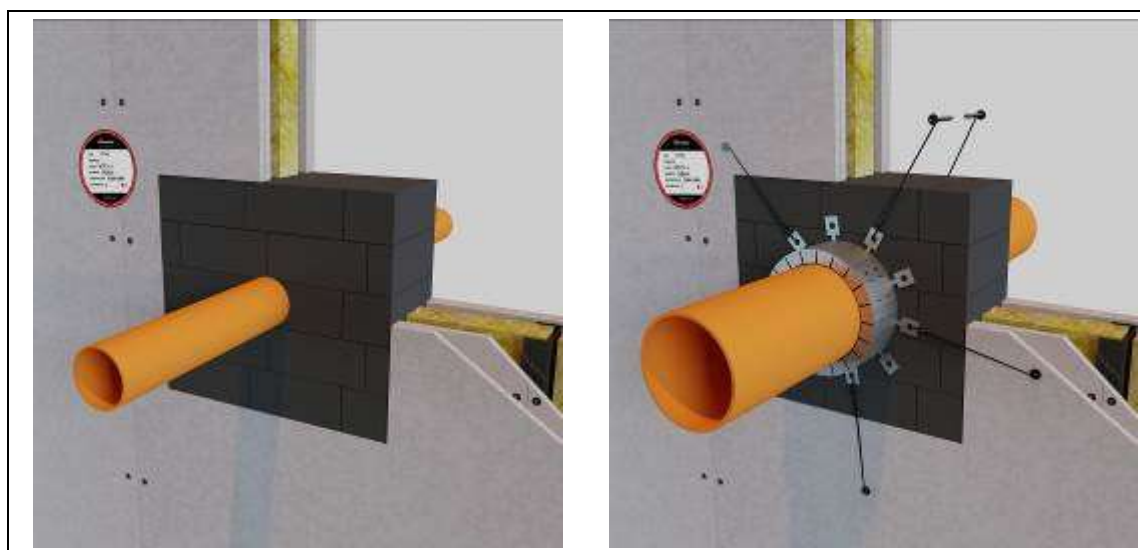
Examples of MASS penetration seal of plastic pipes in flexible walls.
